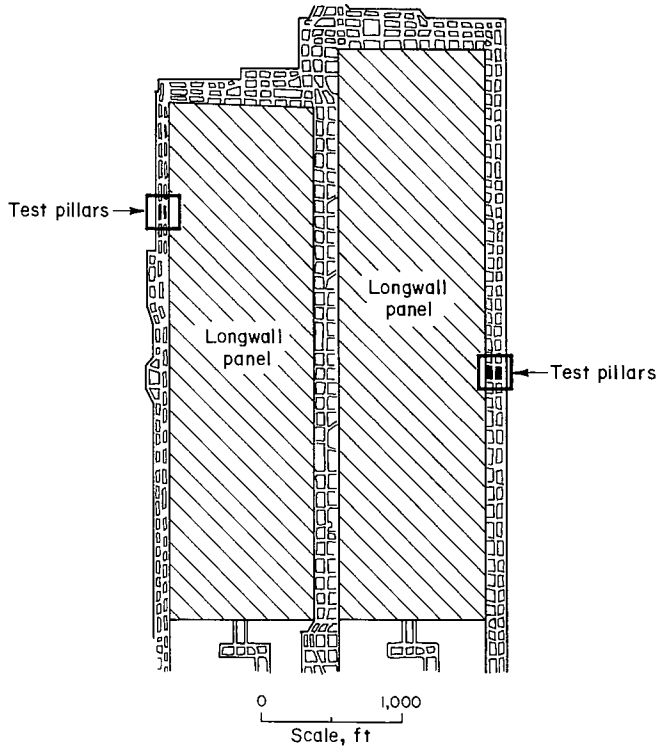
Panel layout and instrumentation sites at mine D (after Mark (74)).
